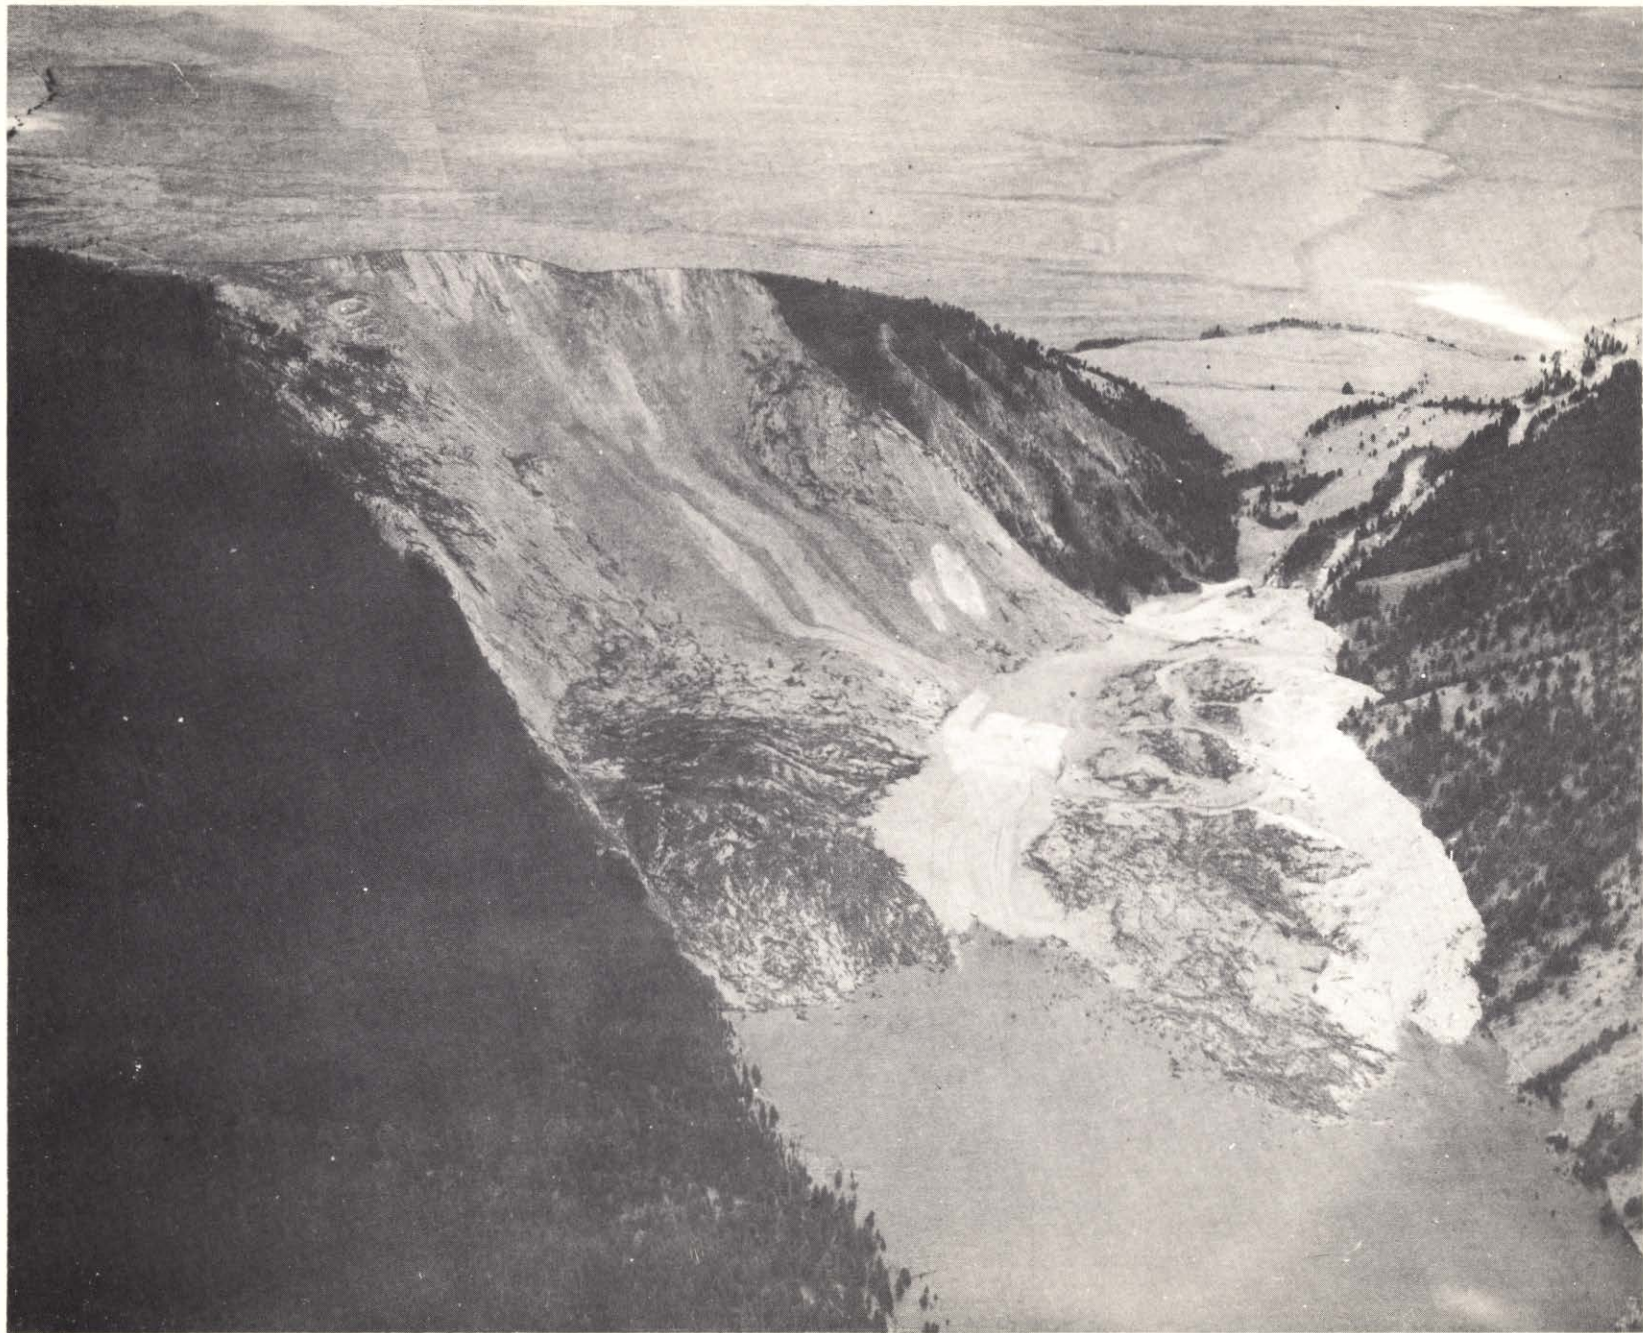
3 September 1959. Over-all aerial view looking downstream showing initial spillway construction and a view of the slide scar.
